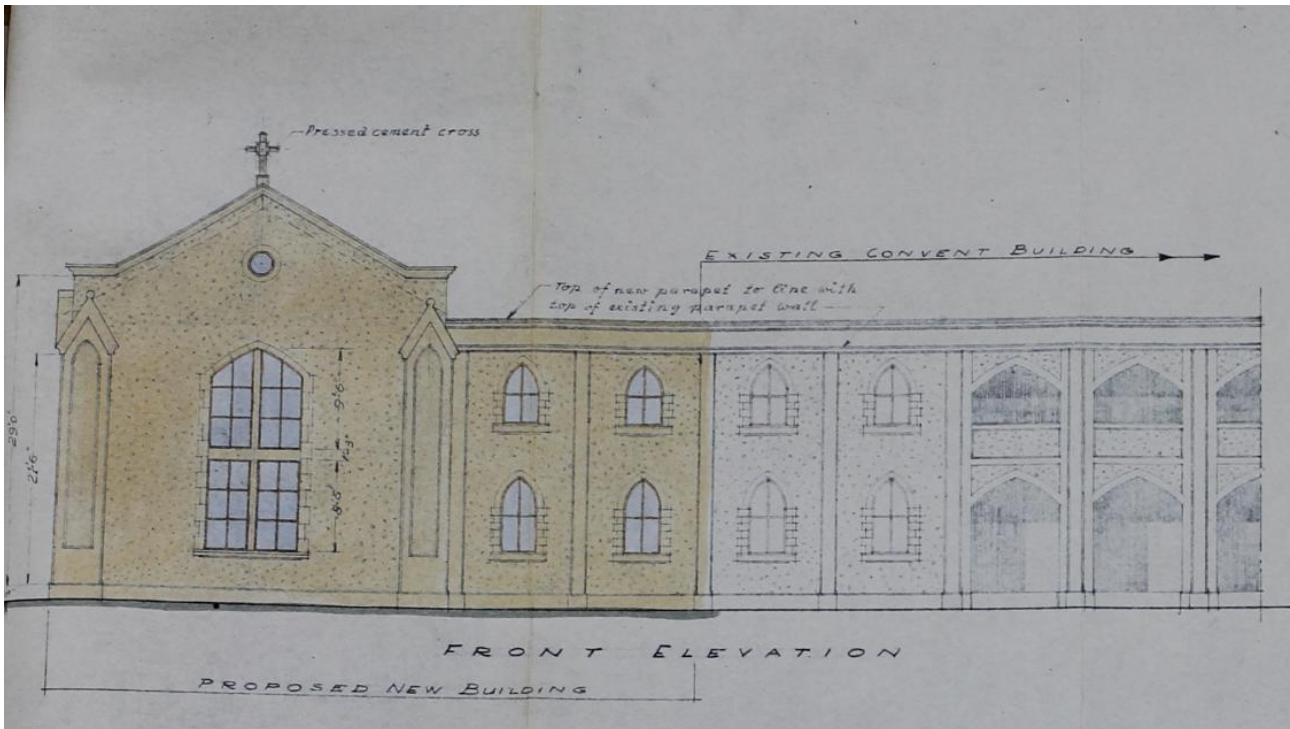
1954 elevation drawing of the Walsh building and the northern extension of the interwar verandah
